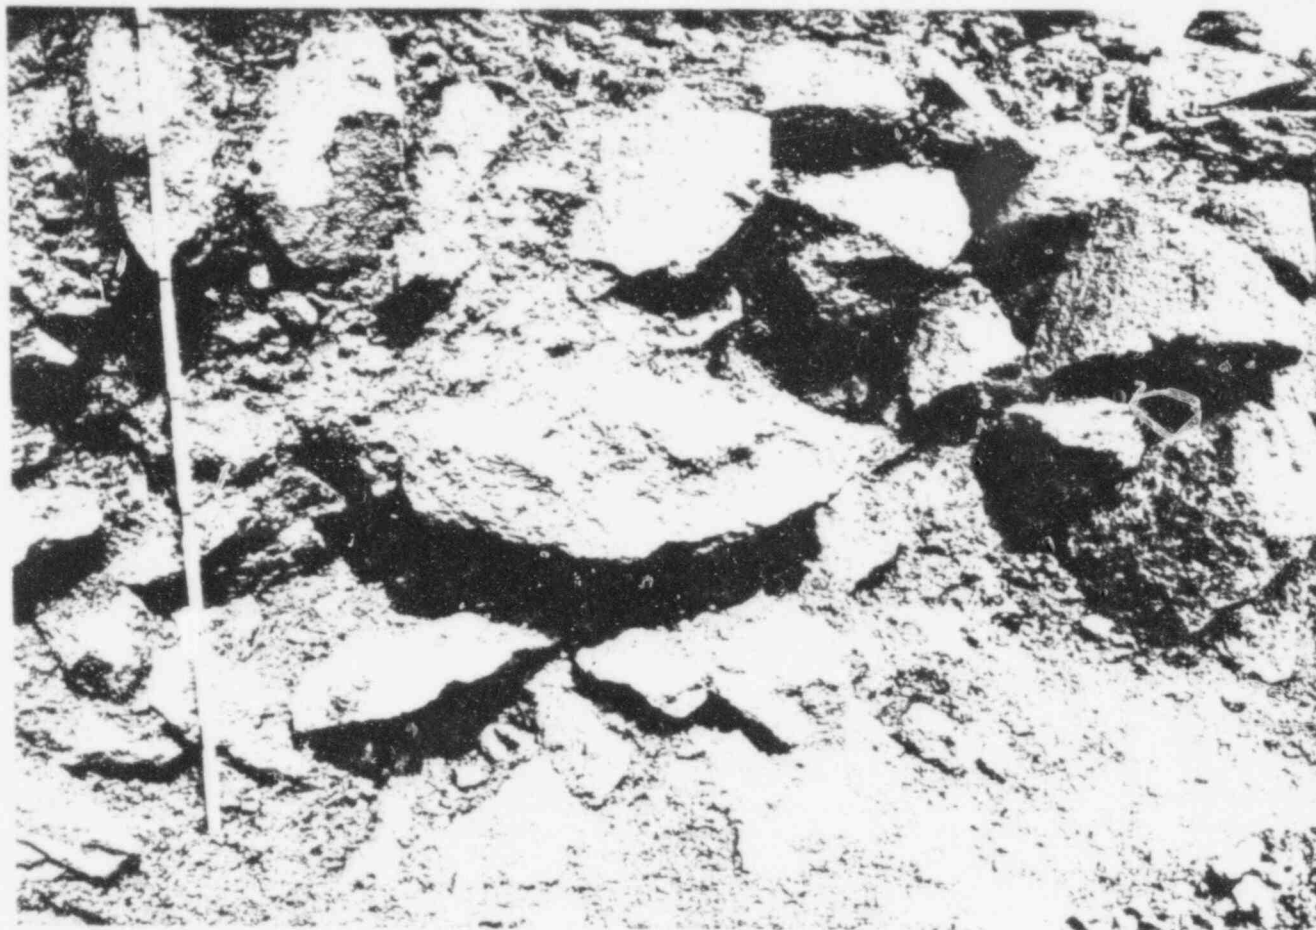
Close-up of Cross Section of Test Section VRMD-24-2-4
